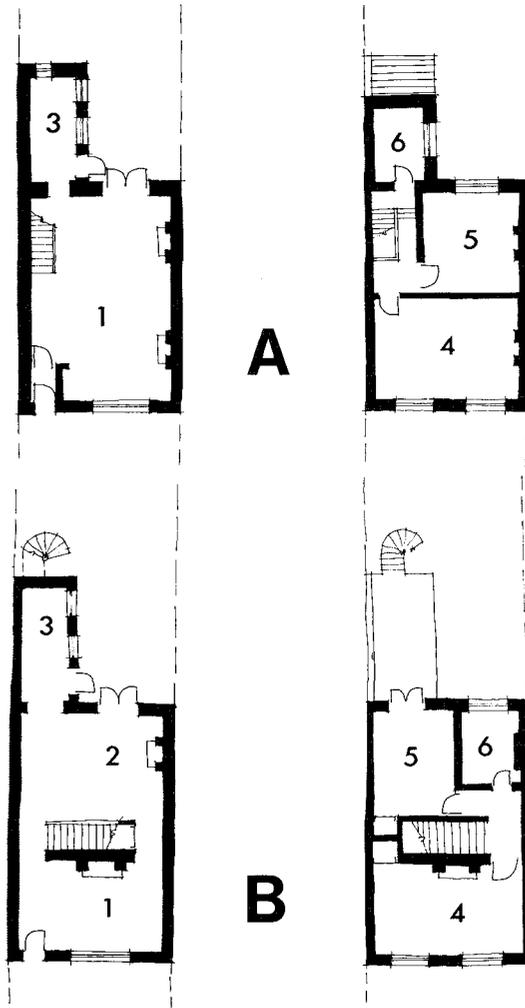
Actual conversions of types A and B by 'new' middle class owners. Ground floor: 1, 1/2, living-dining room with staircase incorporated into room and garden entrance; 3, kitchen. First floor: 4, main bedroom; 5, second bedroom, type B has roof terrace and stairs to garden; 6, bathroom.
